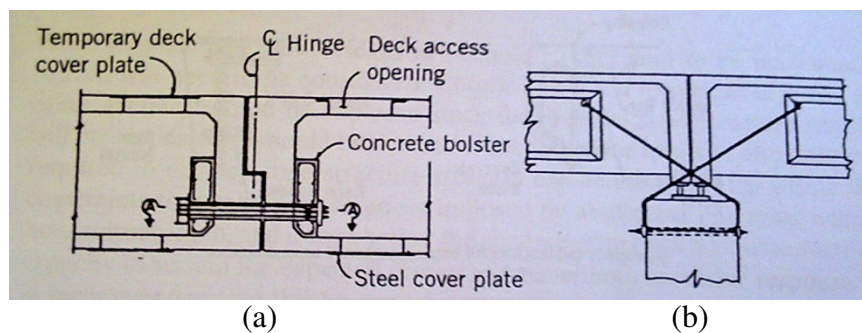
Cable restrainers for concrete superstructure movement joints. (a) Box-girder bridges; (b) I-girder bridges (Adapted from Priestley et al. 1996).
